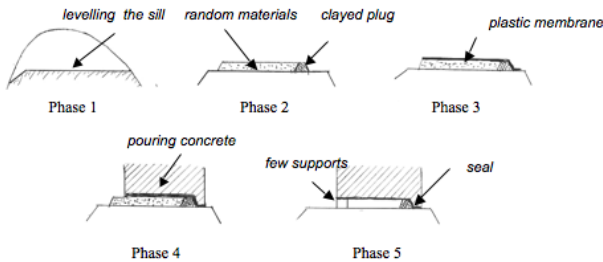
Steps for the block construction with “clay plug” (drawing from [ICOLD - CIDGB 2010])
